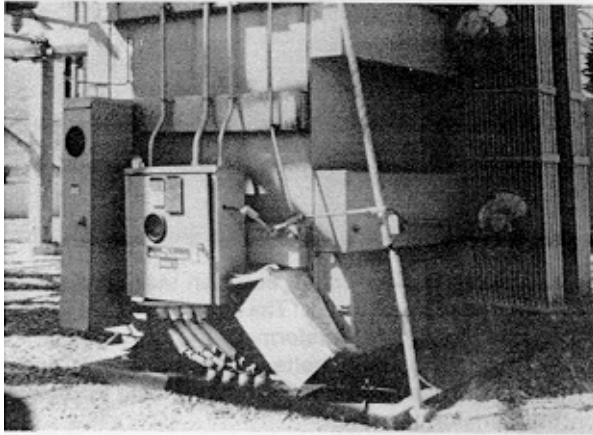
Transformer control cable damage. Sliding of an unanchored transformer has damaged control cables and piping penetration allowing transformer oil to leak
